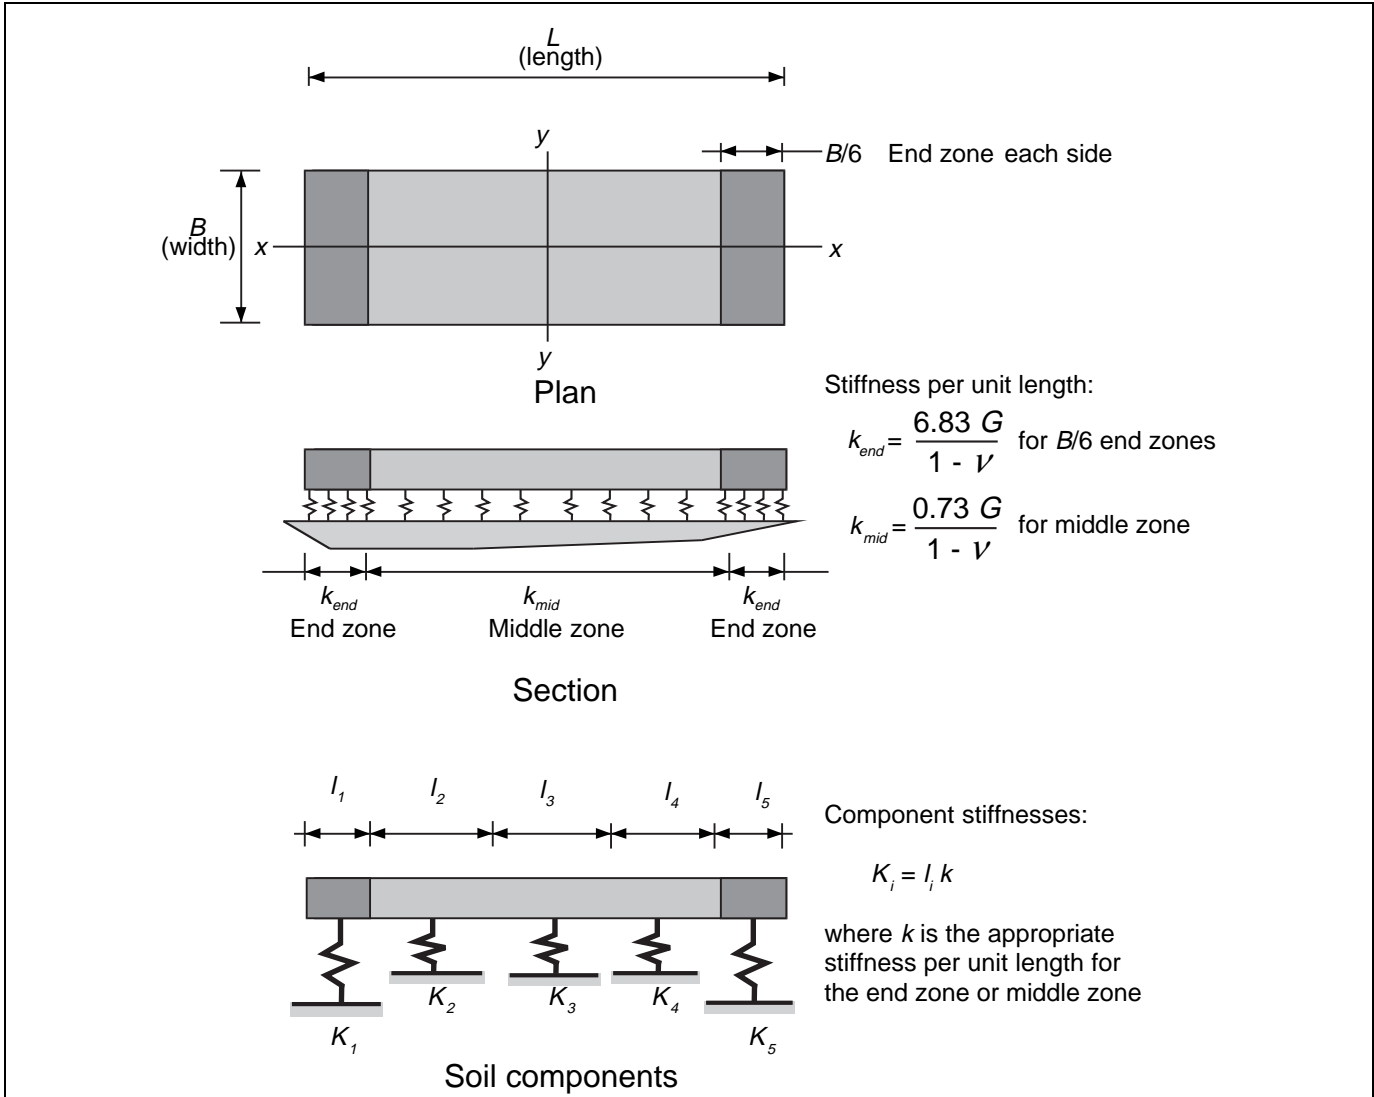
Vertical Stiffness Modeling for Shallow Bearing Footings
